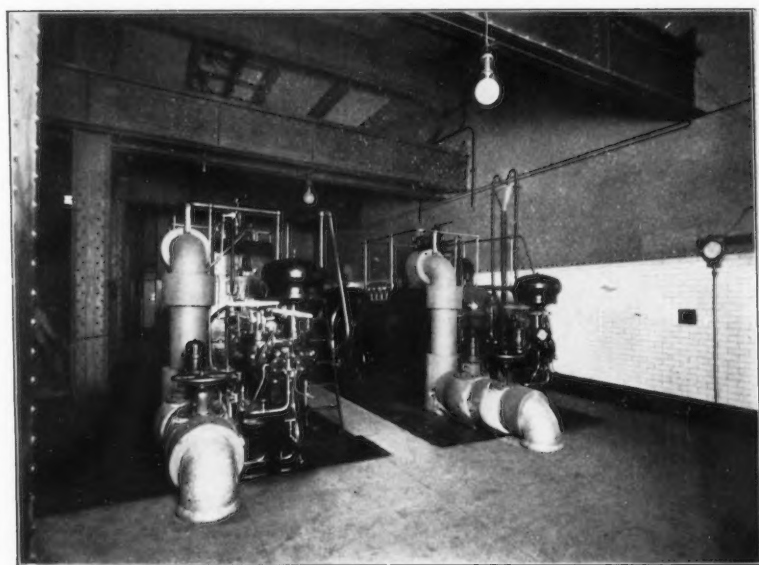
HYDRAULIC ELEVATOR PUMPS IN SERVICE PLANT.
